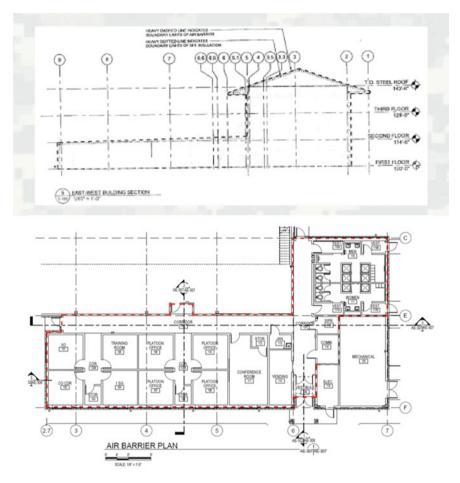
Air barrier boundaries shown on a building section (a) and a plan (b)
